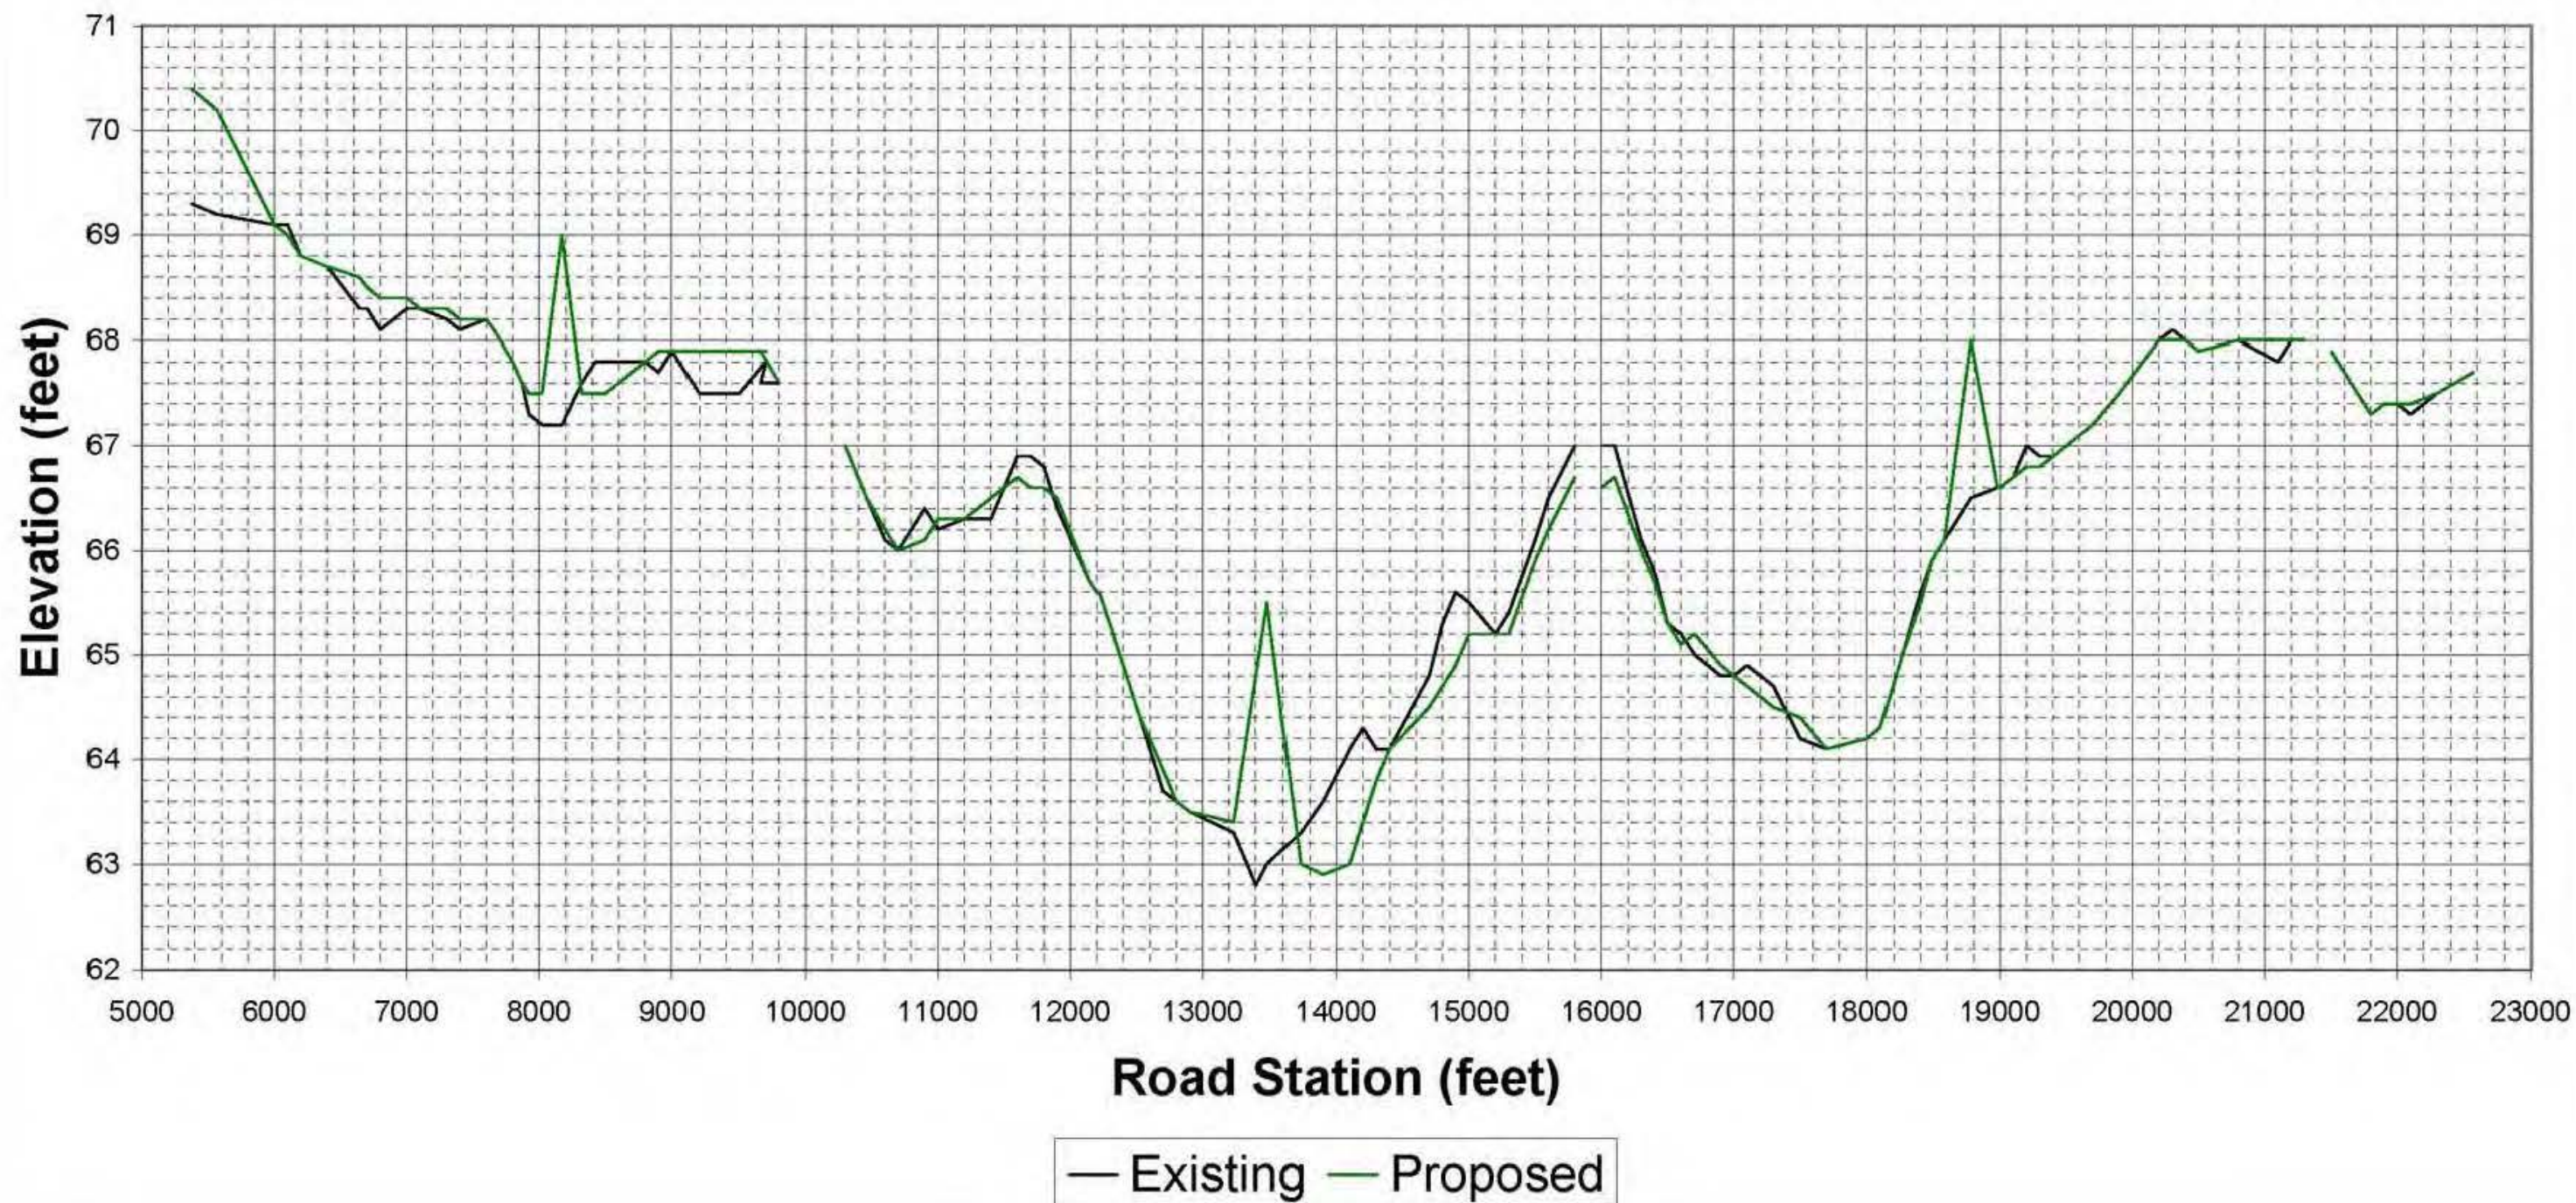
Existing and Proposed Road Crown Profile, County Road 98
